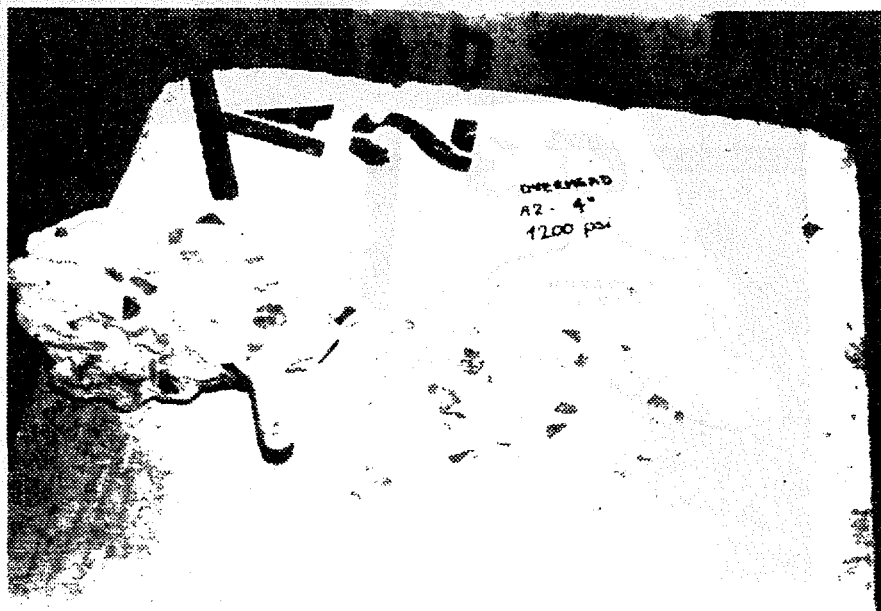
Double cone and partial bond failure. Epoxy Brand 1 (grade 3). Overhead grouting.
